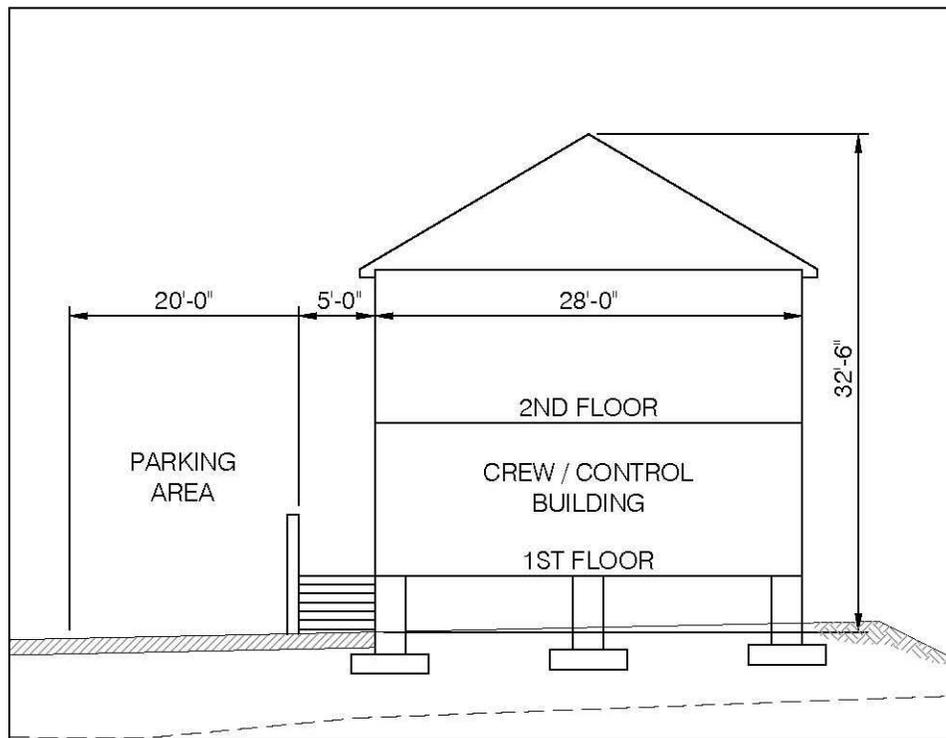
Elevation view of a possible configuration for the control facilities and crew building.
